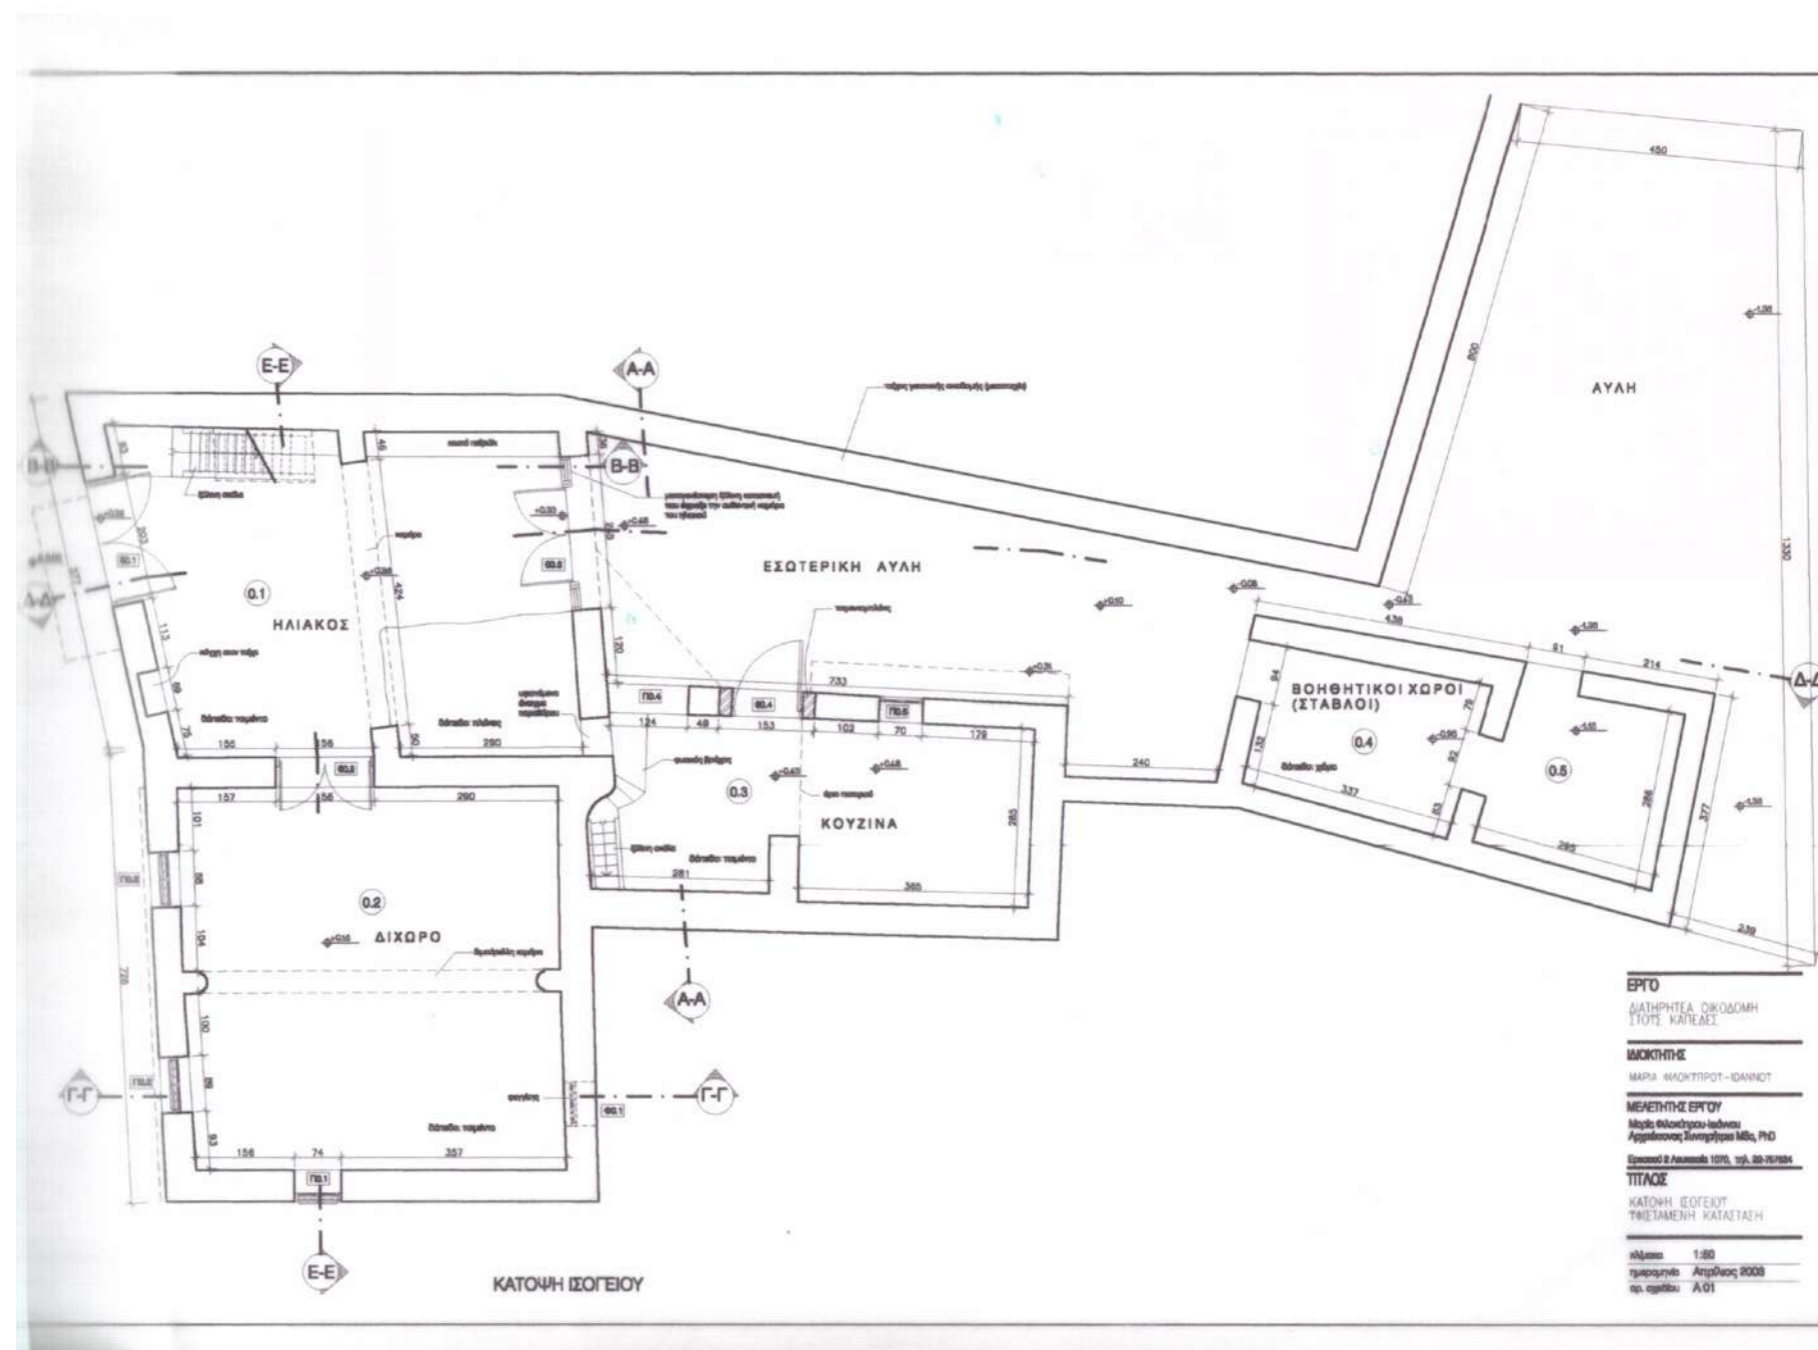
Plan of the dwelling before restoration. © M. Philokyprou
